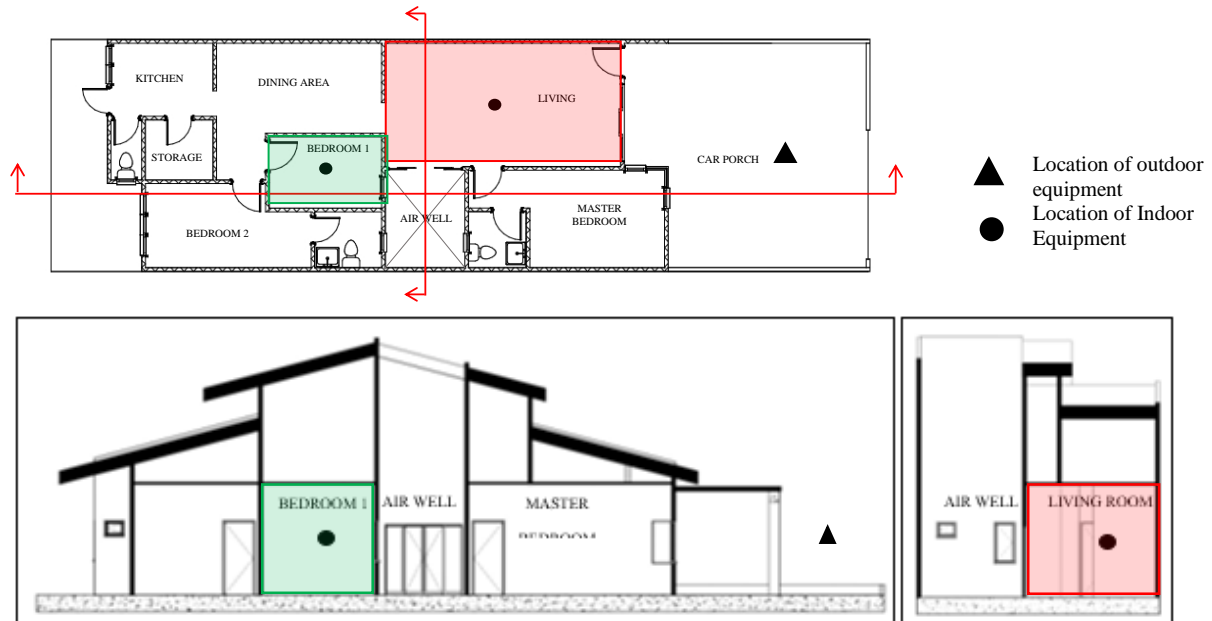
Floor Plan and Section of Air-Welled-Type Courtyard Terrace House indicating placement of Measuring Instruments.
